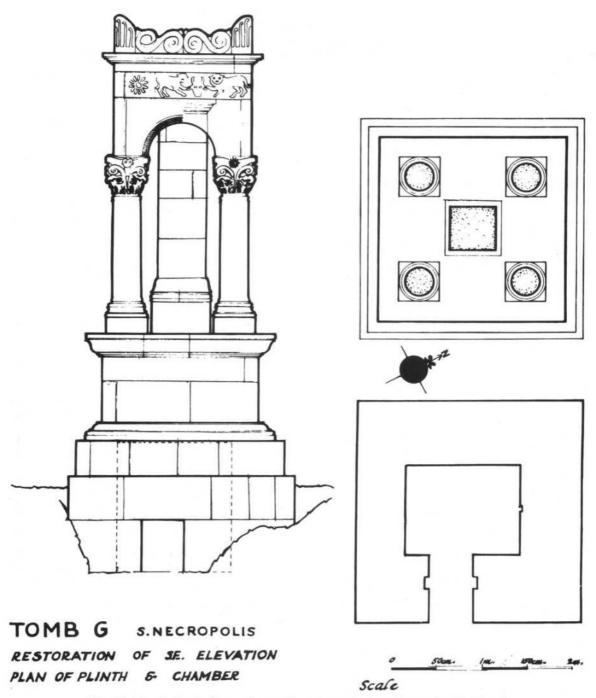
Tomb South G: south-east elevation and plans. Drawn by N. Wood.
